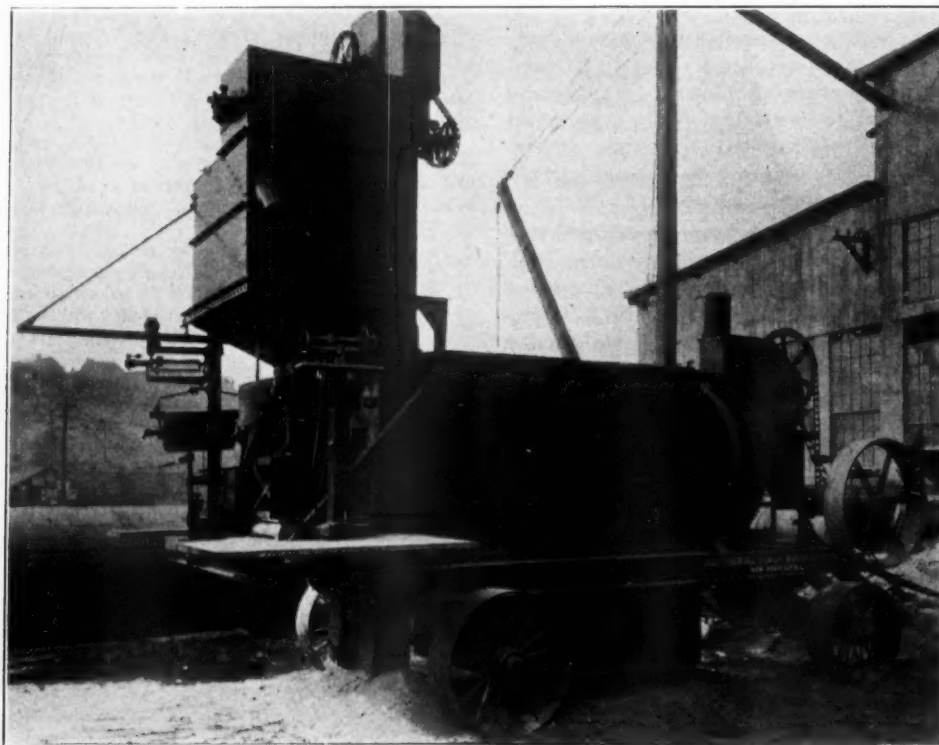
TYPE OF MIXING PLANT USED IN MANUFACTURE OF BITUMINOUS CONCRETE FOR 35 MILES OF PAVEMENT AT ASHOKAN, N. Y.
